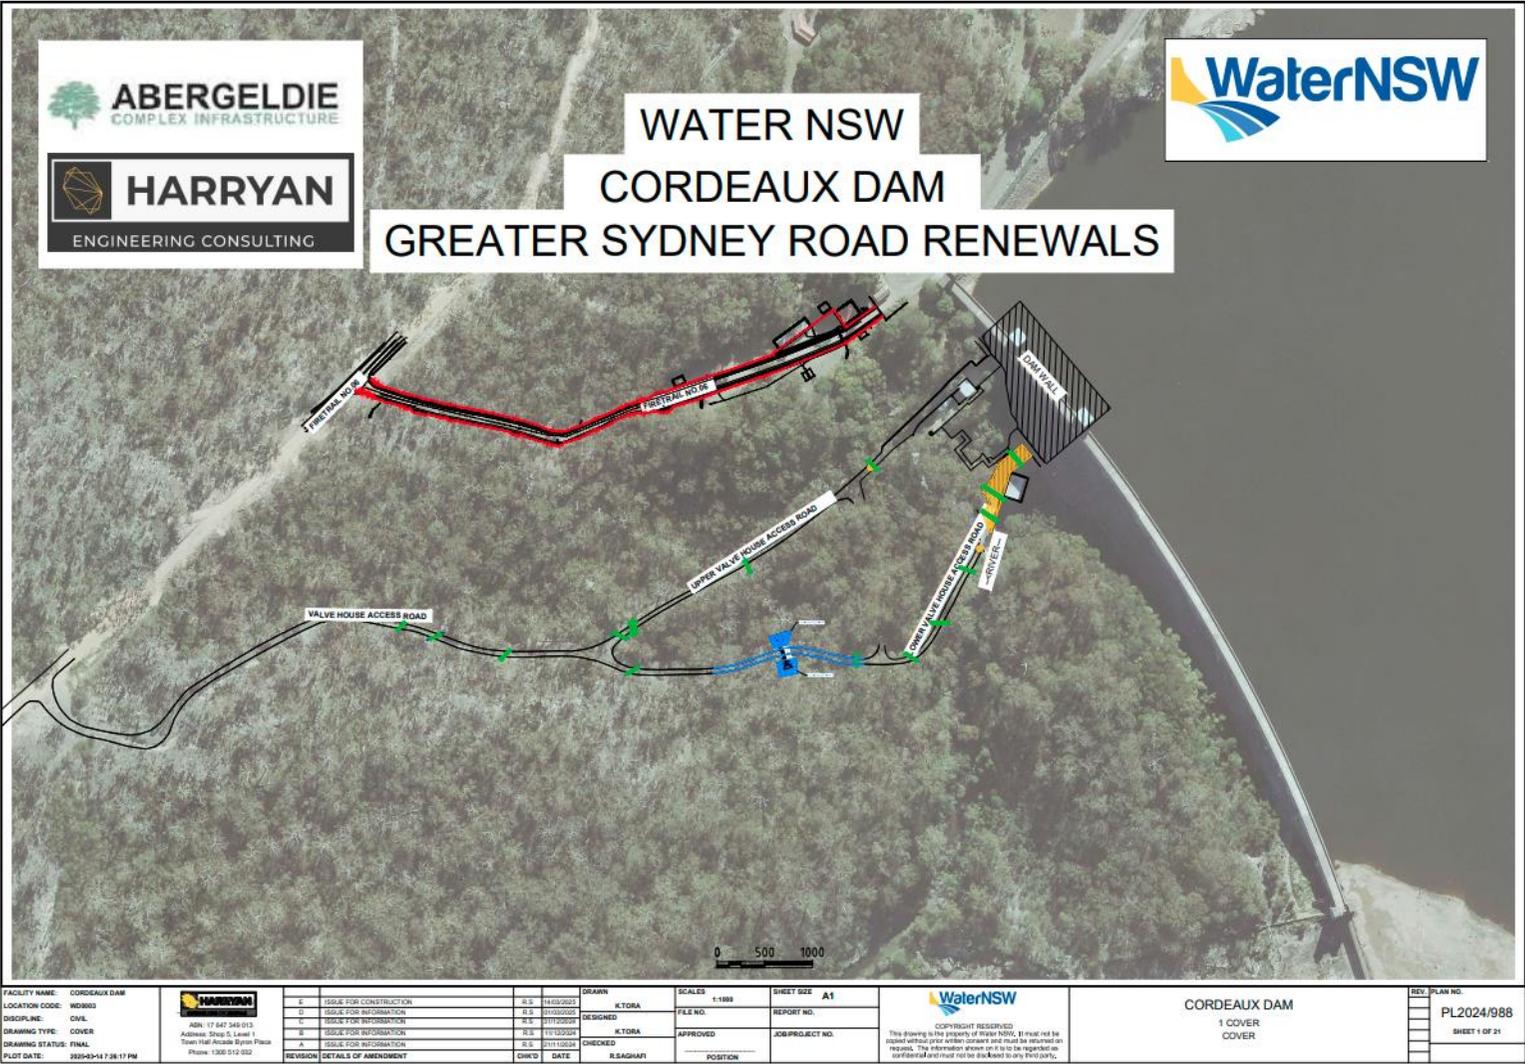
Construction areas (Source: Cordeaux Dam Construction Drawings, Water NSW)
